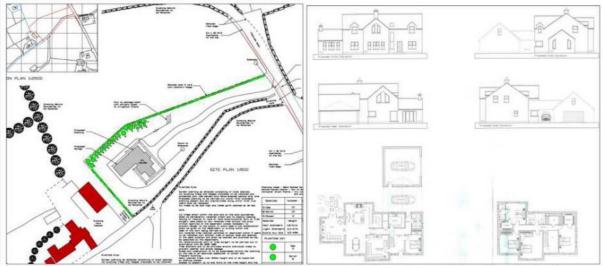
& 6: Proposed site layout; and floor plans and elevations of dwelling including garage, respectively.
